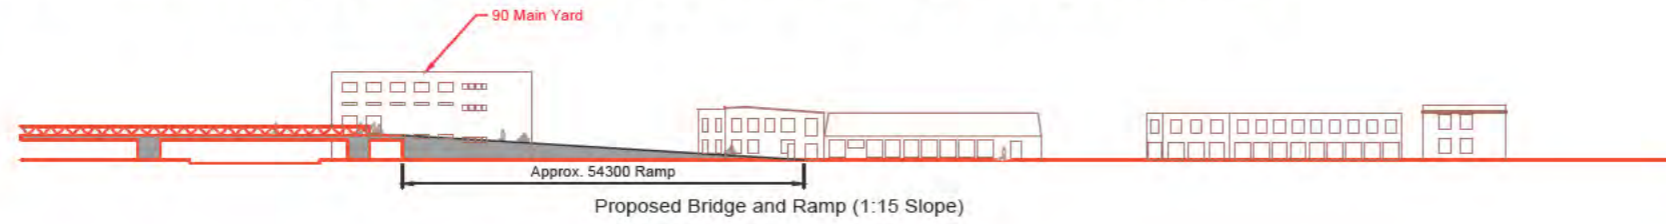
Wallis Road ped/cycle bridge Option G
